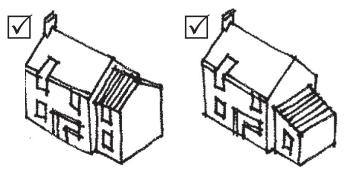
Extensions subservient to original dwelling with sympathetic roof and window details
